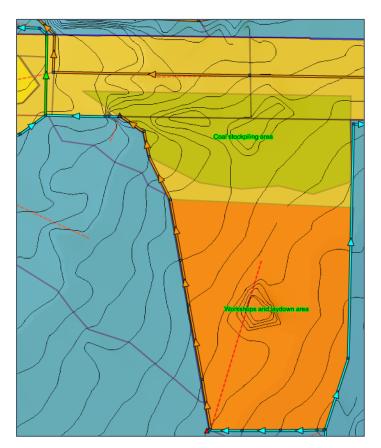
Workshops, laydown area and stockpile area dirty runoff collection and discharge.
